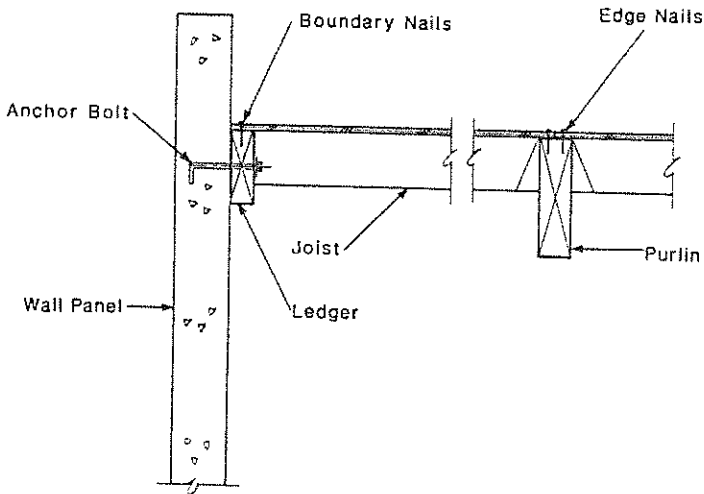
Inspect the diaphragm-to-wall tie for signs of separation. The type of wall-panel anchorage shown above is prone to failure through cross-grain bending in the ledger or through nail pull.
